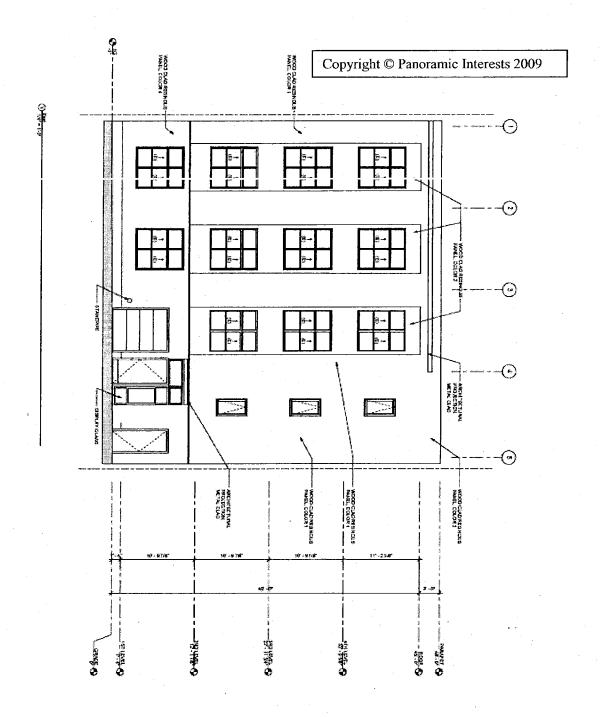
Northeast (Front) Building Elevation 36-38 Harriet Street
